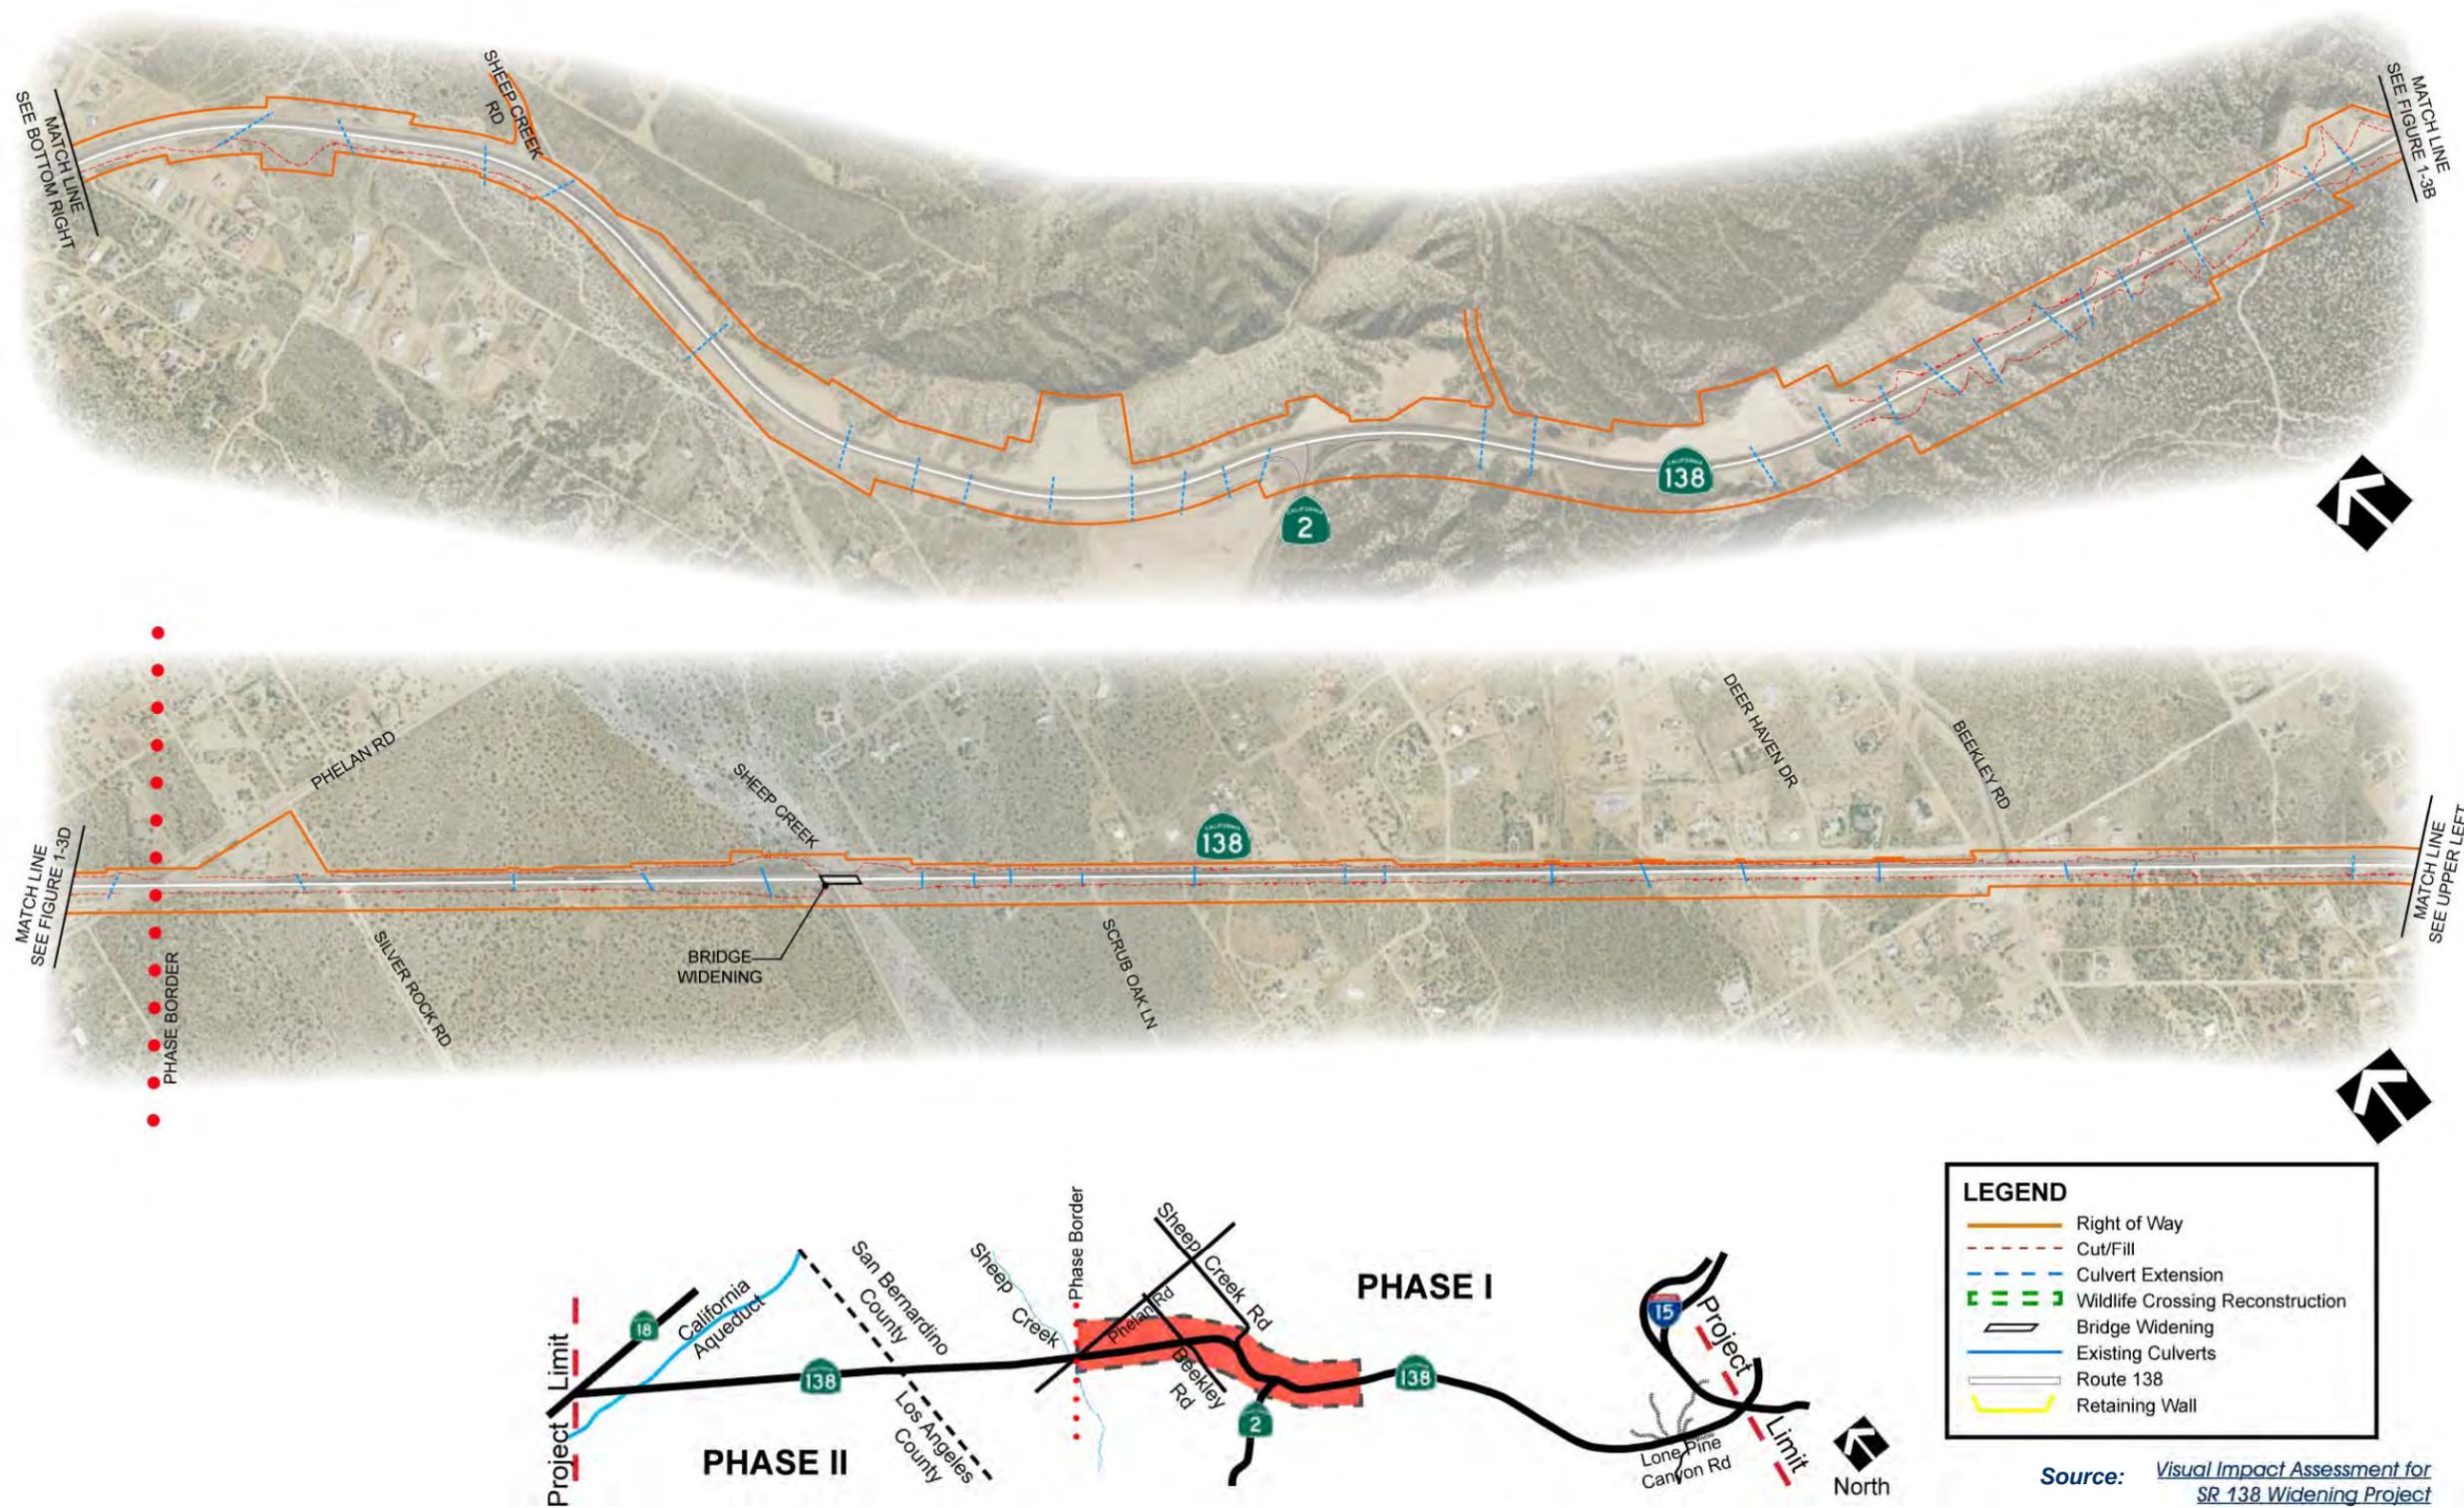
D. Build Alternative, Proposed Widening and Project Features
